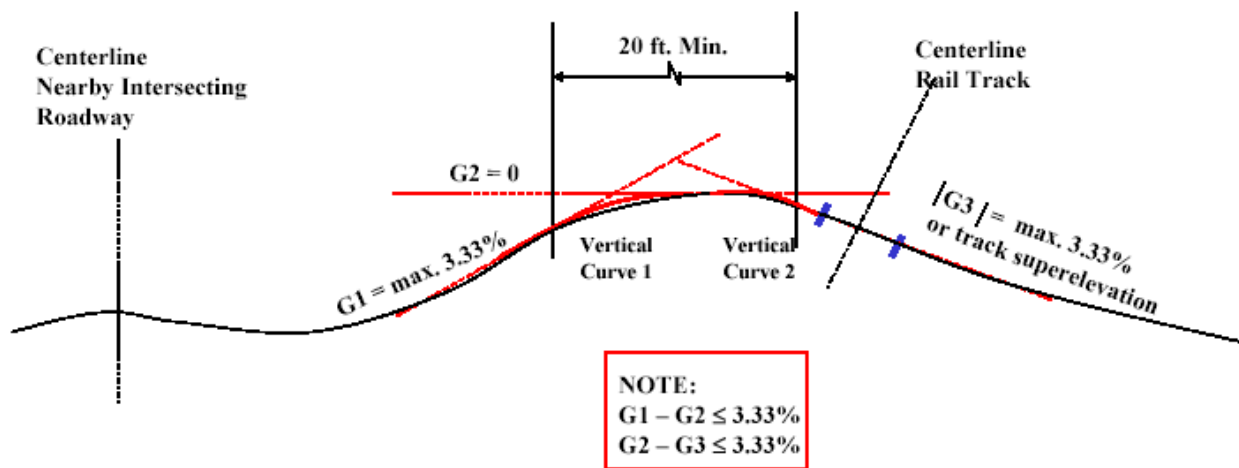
Fitting Two Vertical Crest Curves To A Railroad Crossing With Superelevated Tracks.
